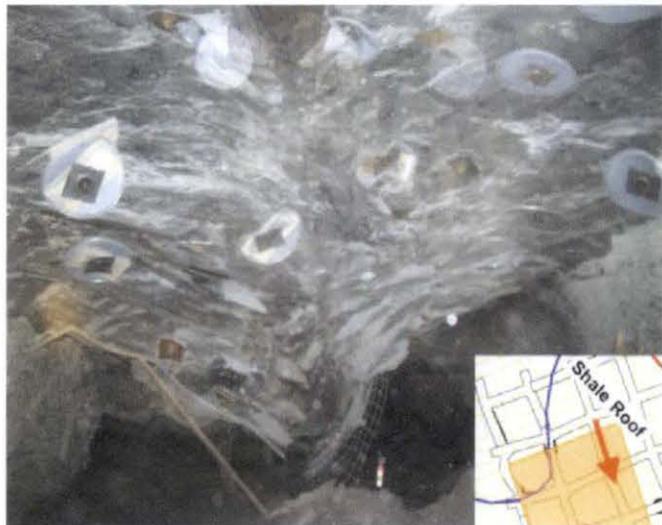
Failed shale roof under No. 2 Gas Seam remnant barrier where roof is being squeezed downward by pressure from Powellton Seam pillar and immediate roof dilation.
